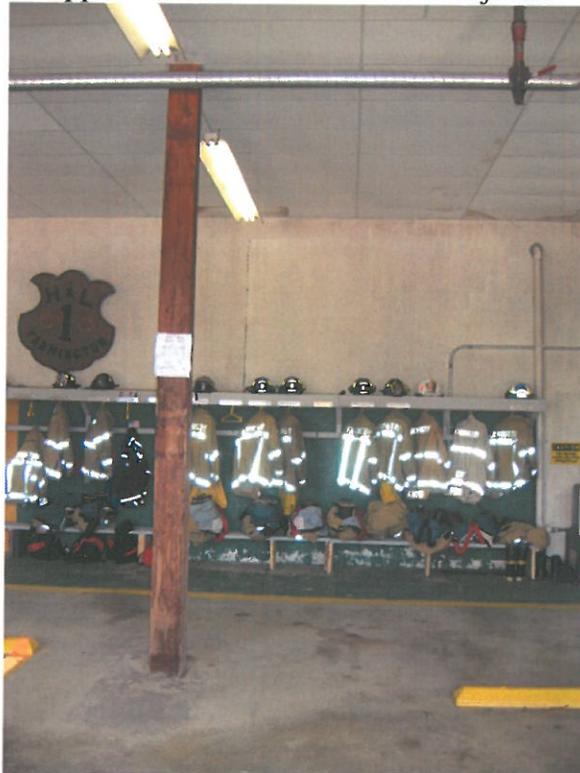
Northeast wall approximately 19 feet from east corner. Note this is the same control joint shown in photo 17.
